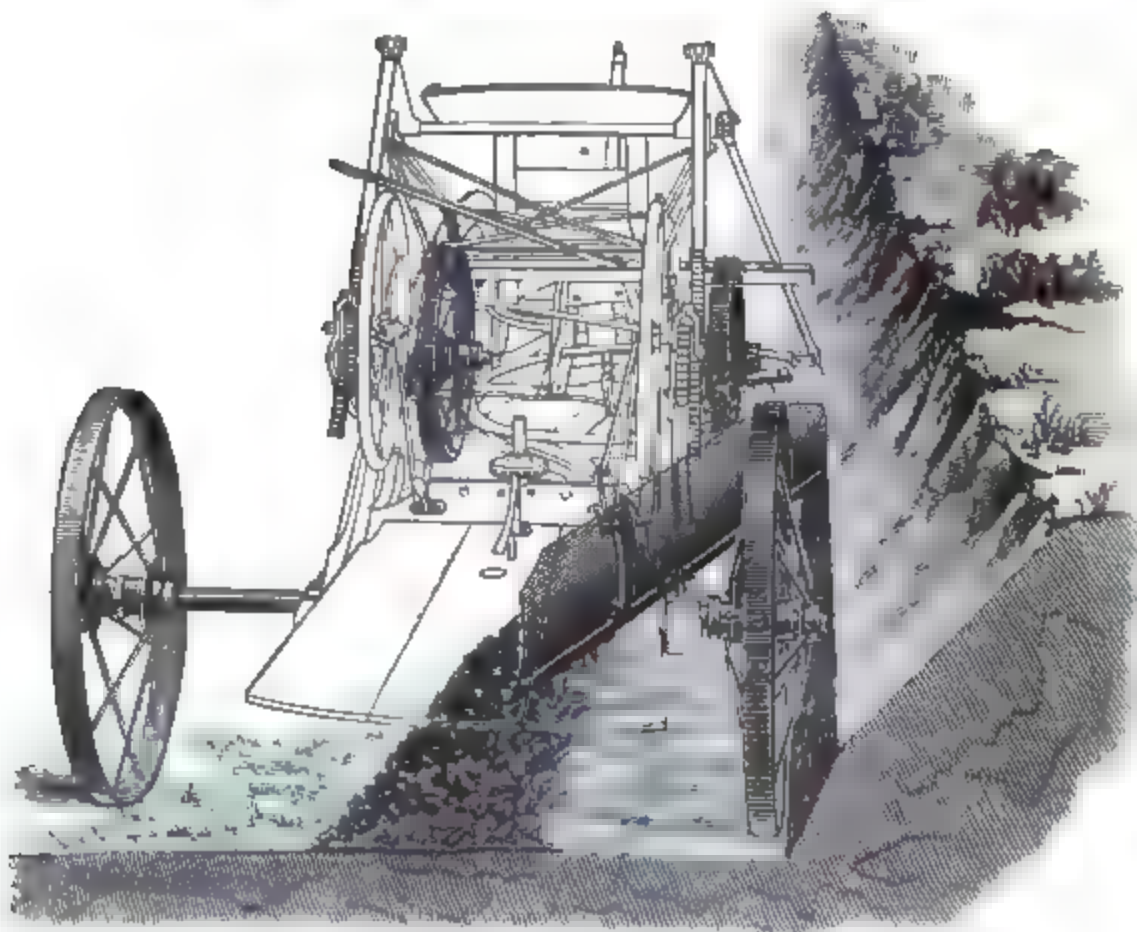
SCRAPING GRADER CUTTING AWAY OLD BANK.
